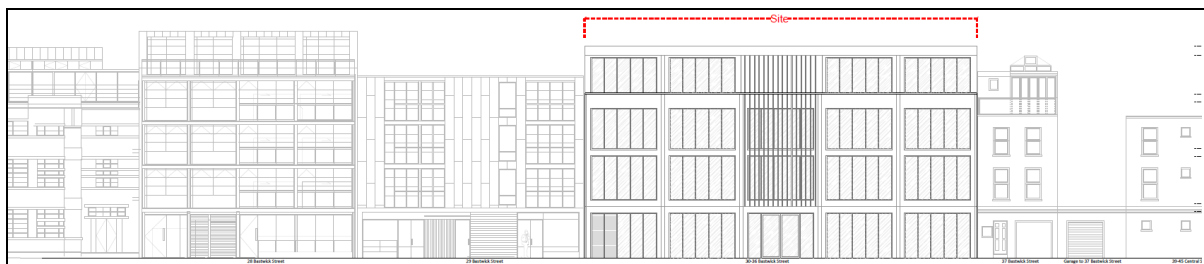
Drawing 1927.PP.14 showing the front elevation in the wider Bastwick Street context
